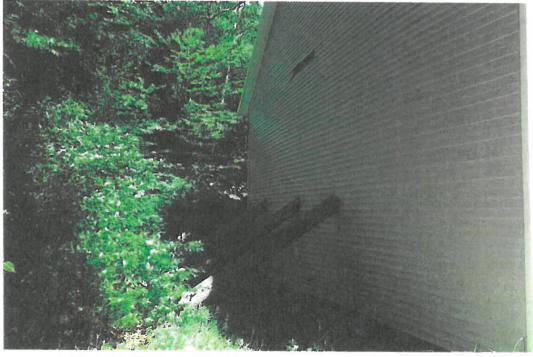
Pinkham 113 – Temporary Buttresses supporting bowed rear wall.
